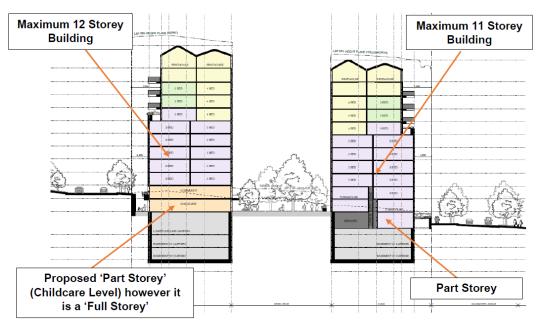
Maximum 11 Storey Building (Area 16) and 12 Storey Building (Area 17)
